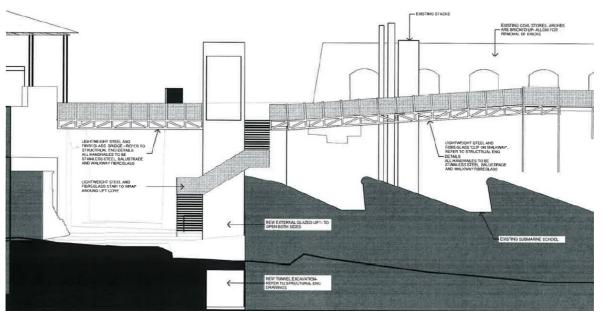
Elevation plan showing the new lift tower, connecting bridge and cantilevered walkway
